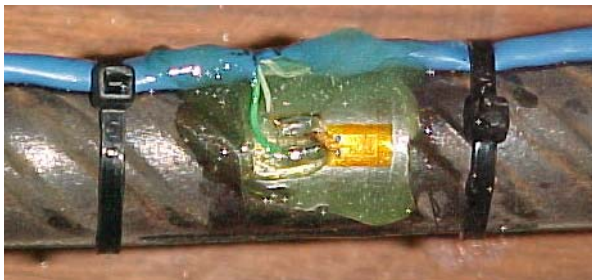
Nail bar with a protected strain gauge and a grouting tube.
